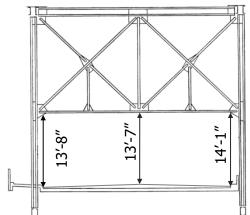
Cross-section view of a through truss bridge showing minimum vertical clearance.
